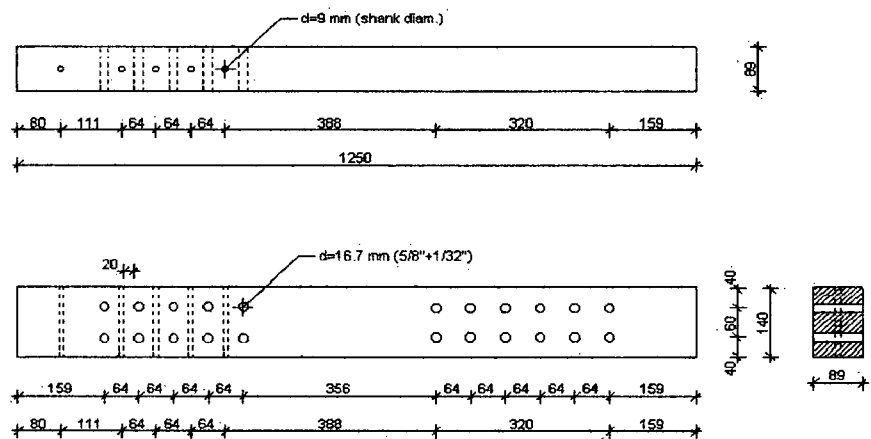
Lag screw reinforced specimen layouts (rods at the bolt positions)
